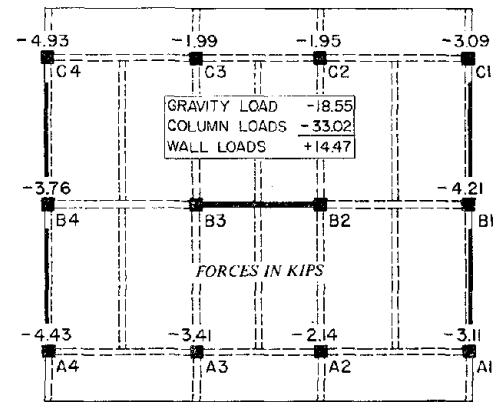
MEASURED COLUMN LOAD AFTER EACH INDIVIDUAL I.F.T. WAS INSTALLED.
